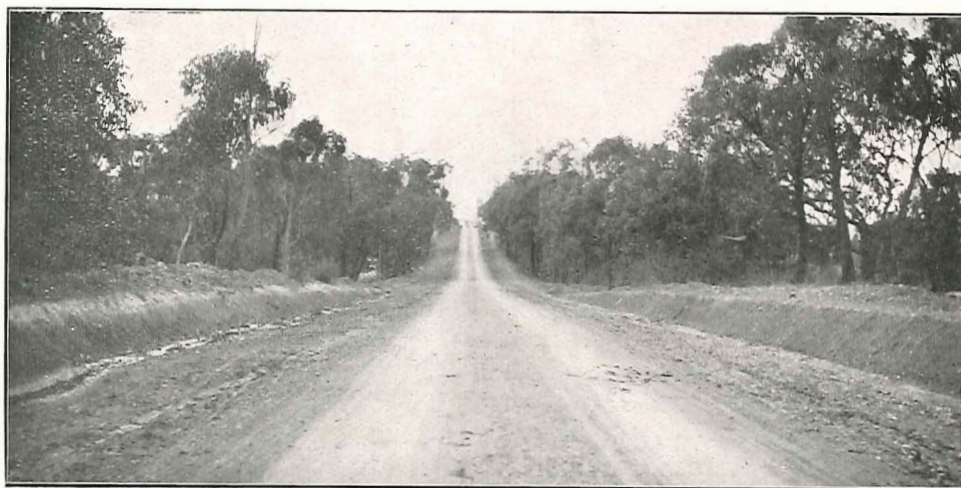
Completed section Frankston-Flinders Road, Shire of Frankston and Hastings.
